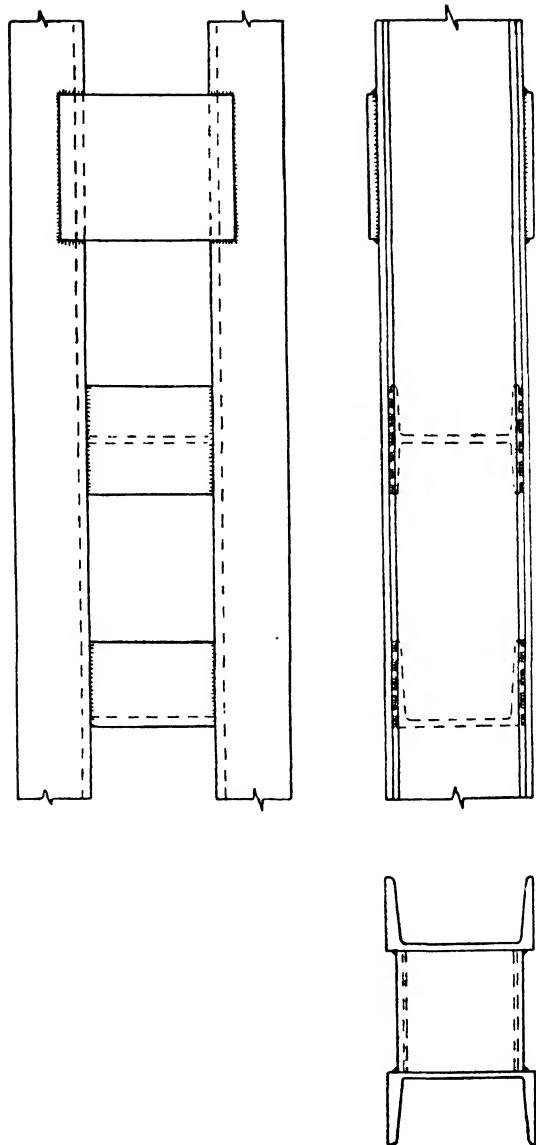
SPACING PIECES AND BATTENS FOR DOUBLE-ANGLE COMPRESSION MEMBERS
